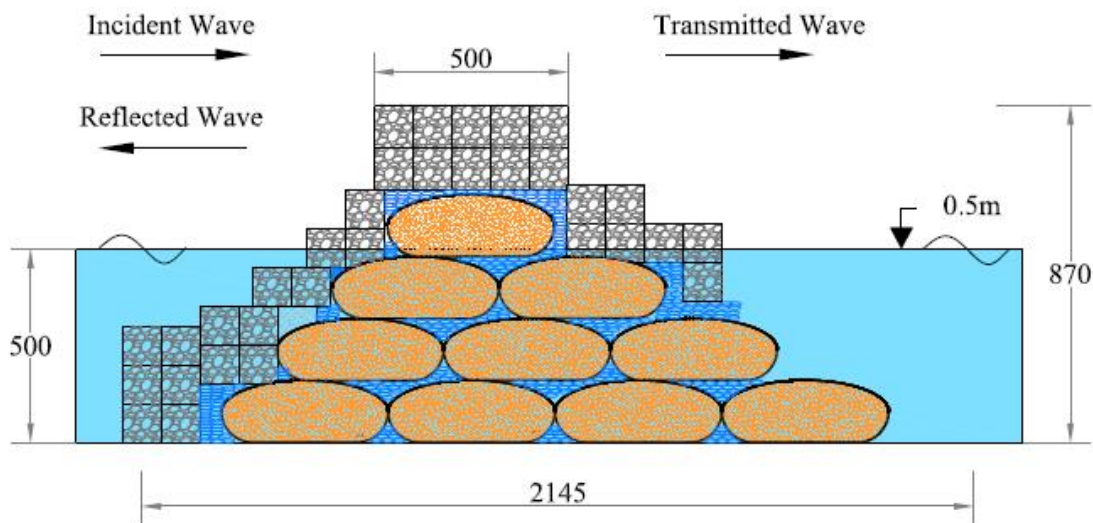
Typical Cross Section of Geotextile tube with Gabion Section (GGTS)
